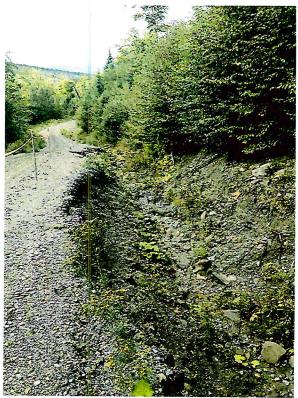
, 2 and 3- Shows the broken boards on the bridges and the eroding approaches.
